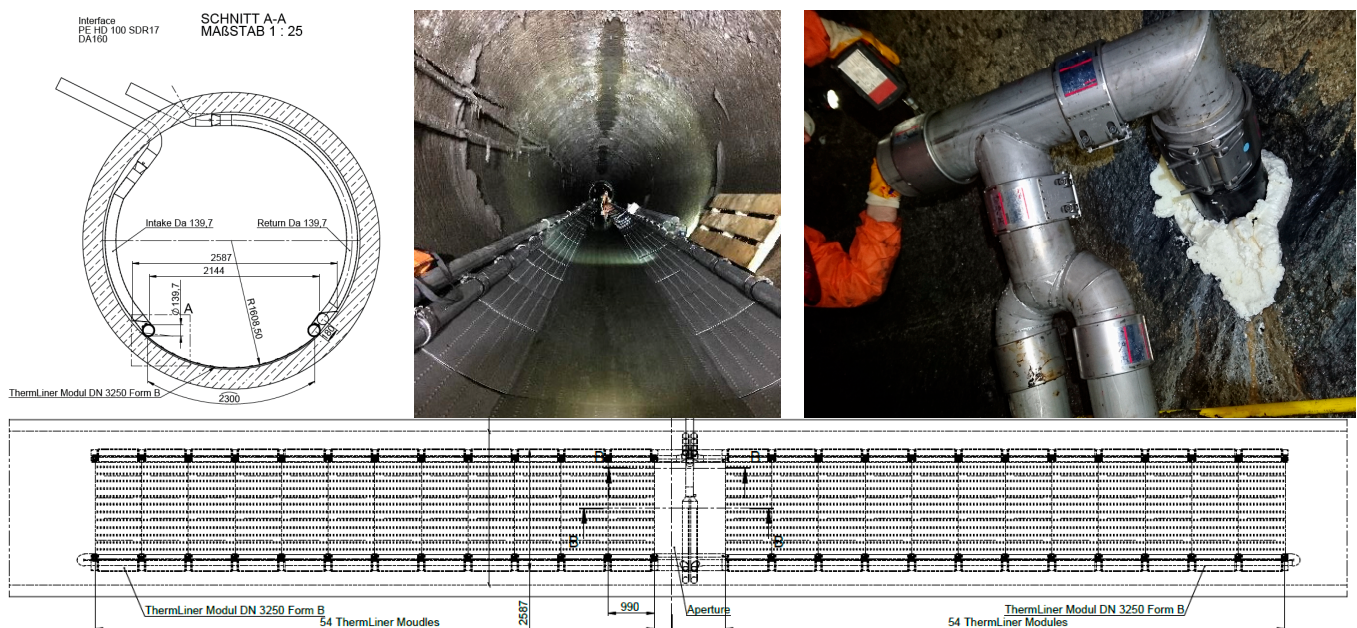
(Top left) design sketch of the heat exchanger system showing a cross-sectional view. (Top center and right) photographs taken during the system installation. (Bottom) overhead design sketch of the system layout above the tunnel floor. Photos by Uhrig/Municipality of Stavanger.
